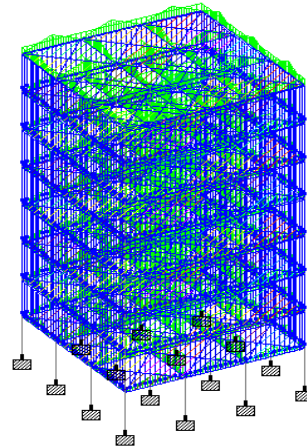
Assigning of Exterior Wall Load (19.69KN/m)
